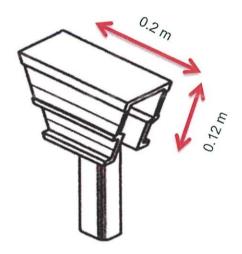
Deck Prop Source: architectjaved.com (n.d)
